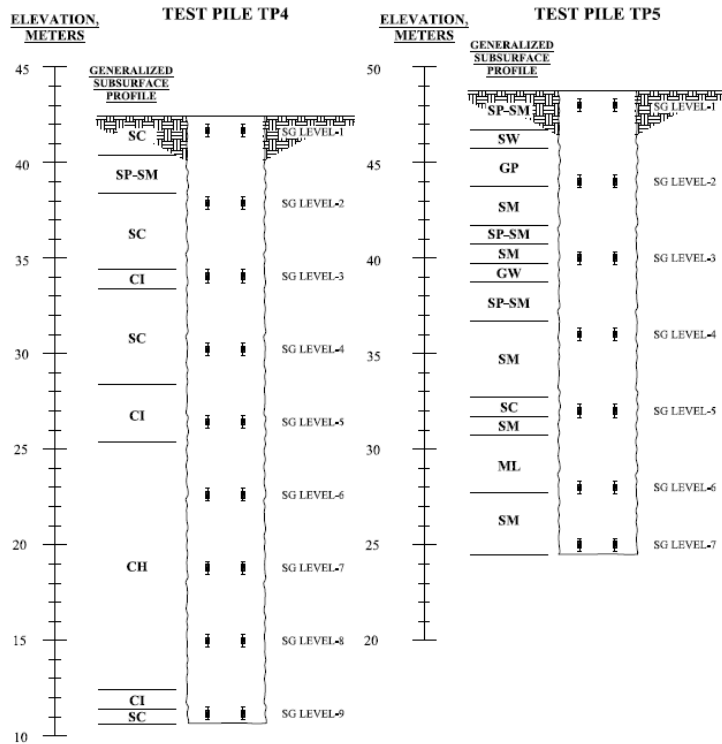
Pile elevation views and instrumentation layout for Project 2
